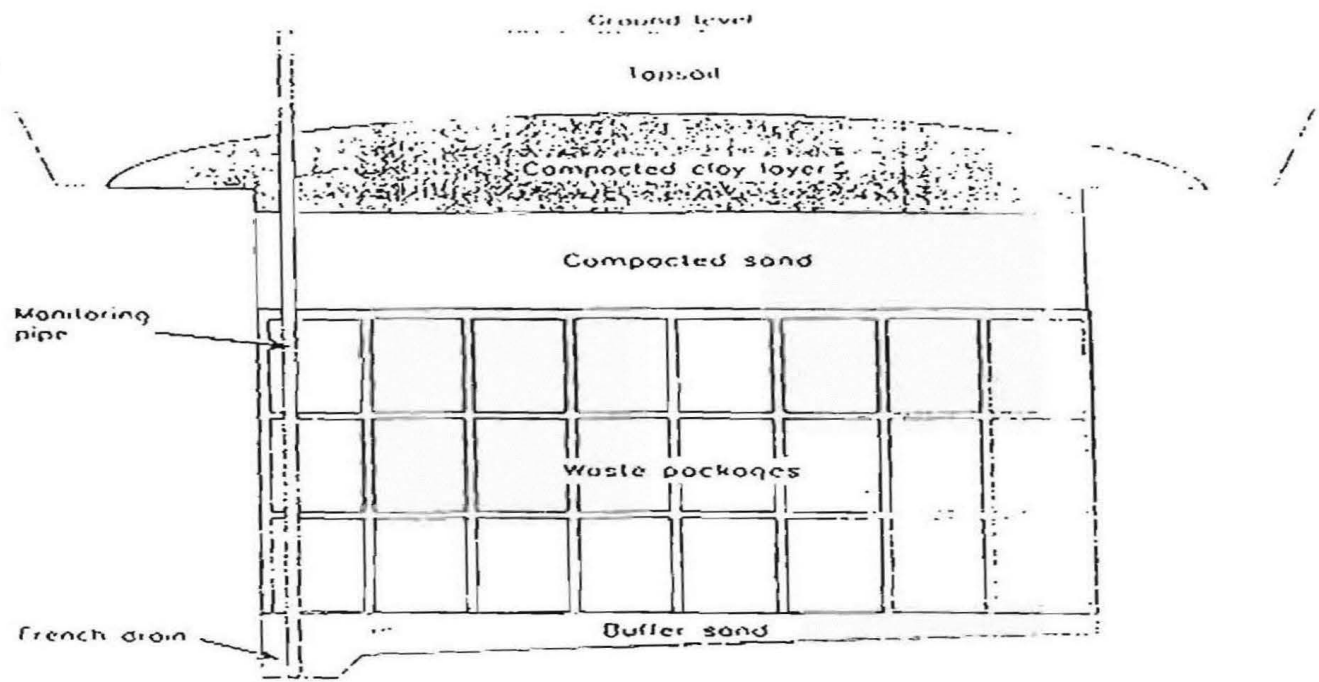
Shallow Land Burial Disposal Facility⁶¹
